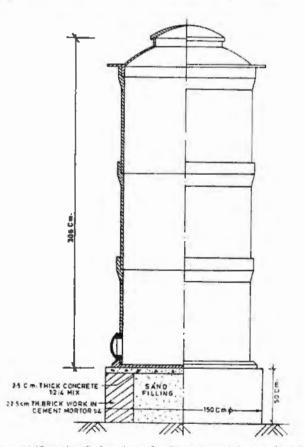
Half sectional elevation of a 3-tonne capacity outdoor bin.
